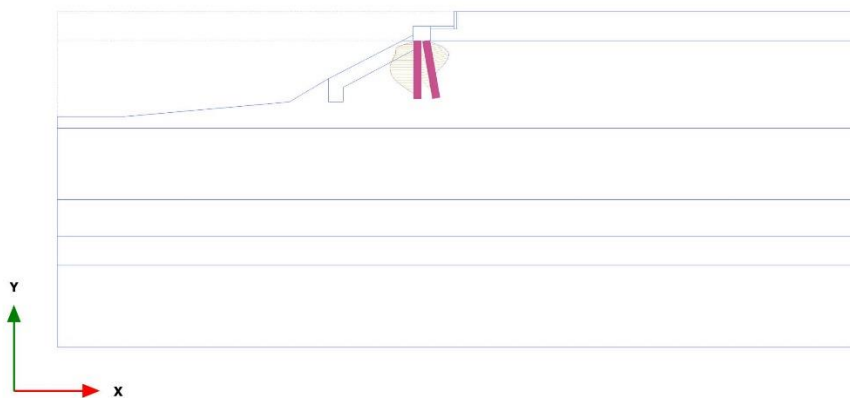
Bridge 2 bending moments for top section at SLS longitudinal
